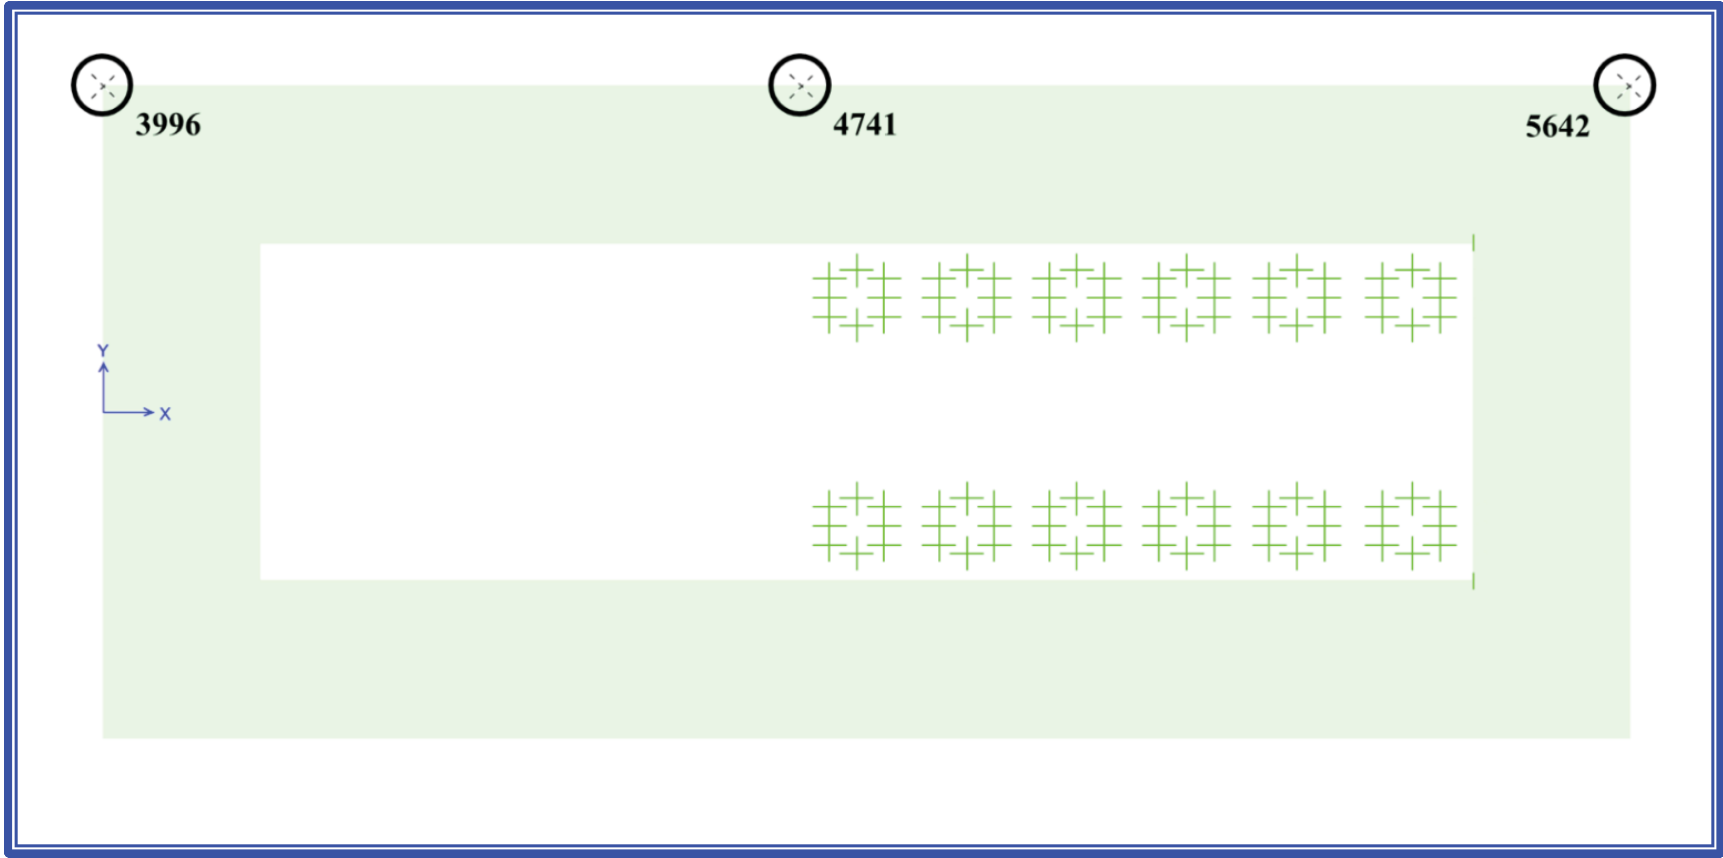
Floor Locations at TOC EL 25'-0"
